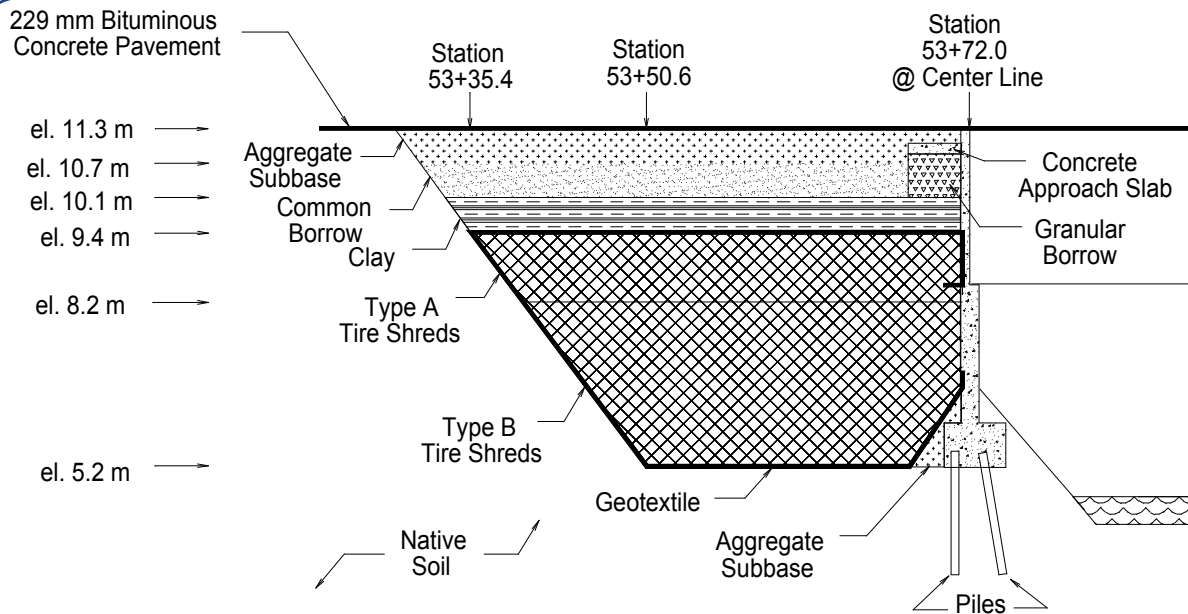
Longitudinal section through North Abutment TDA fill
